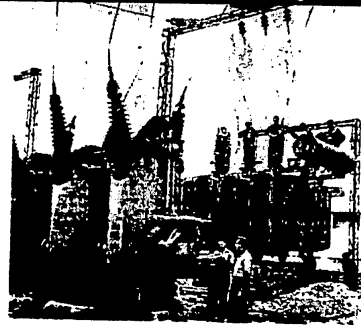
Assembly of power transformers and oil breakers on the open part of Tuzpse substation
